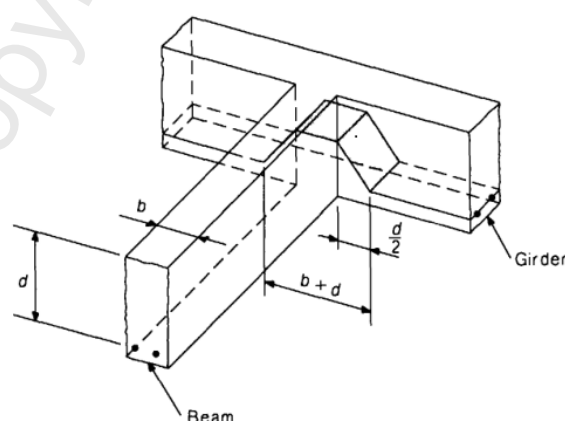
A – Cracking at region where a beam is supported on a girder
